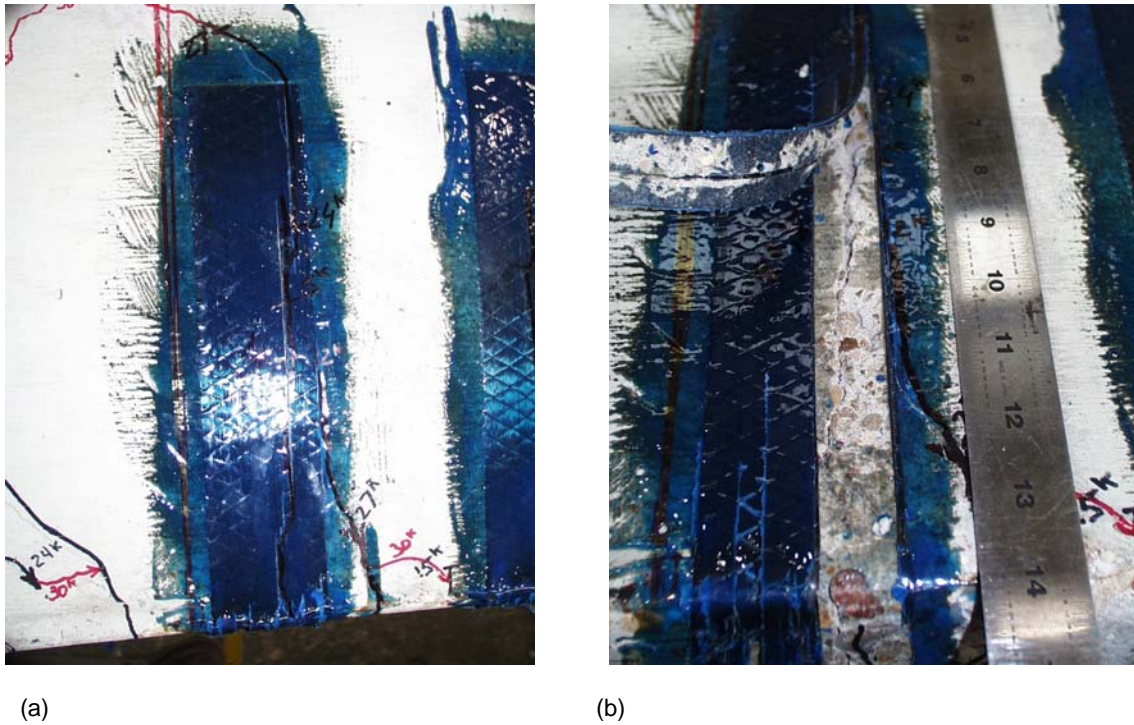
Progression of flexural-shear cracks under transverse straps, beam MB-e6-1/8
